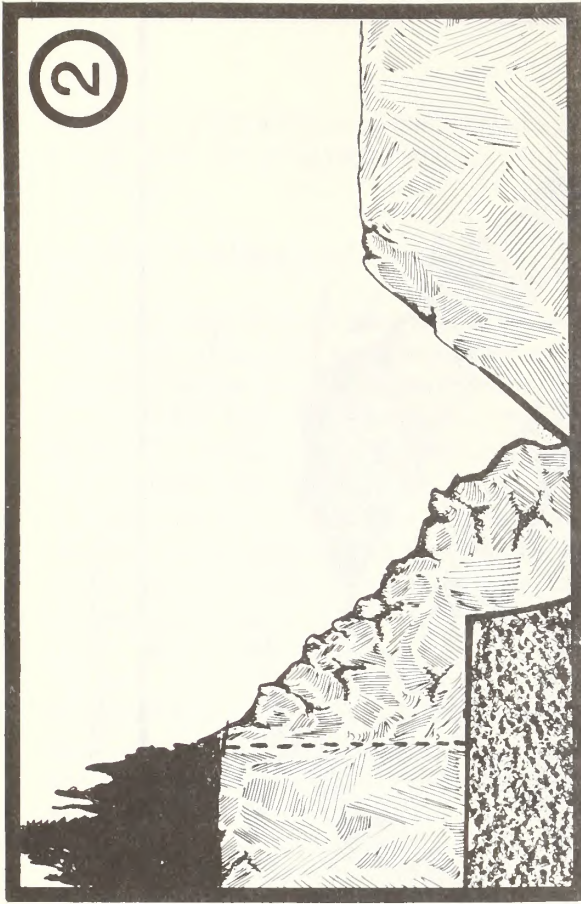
TYPICAL CANYON FILL OVERBURDEN OR SPENT SAND DISPOSAL SITE
